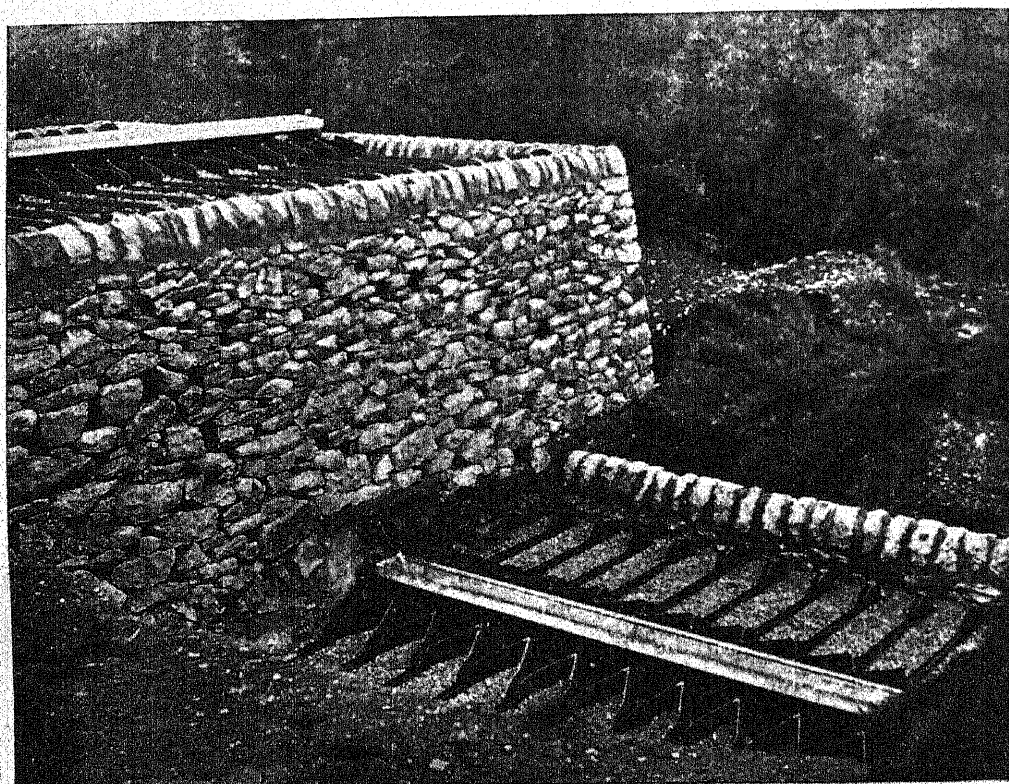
Sewage Works, Thornbridge Hall, Derbyshire.
